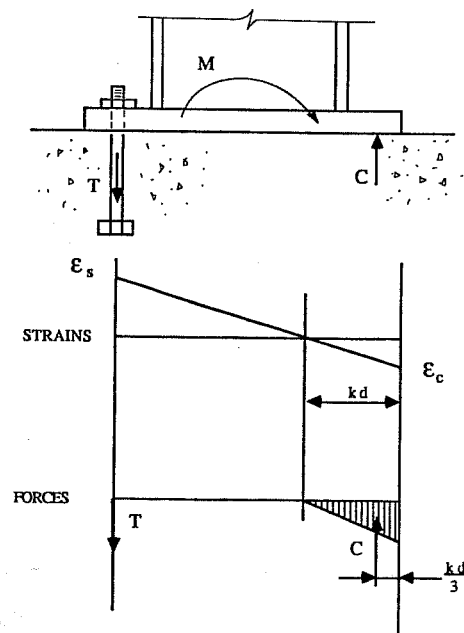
Procedure based on Working-Stress Concrete Beam Design
